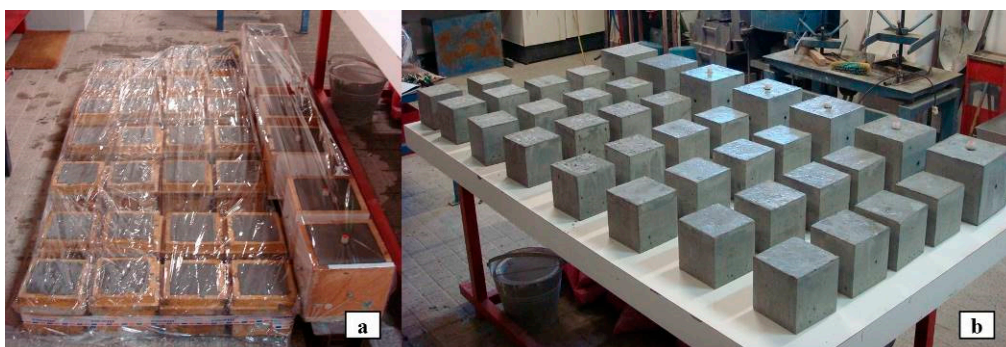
Concrete test specimens: (a) protection, (b) demolding.
